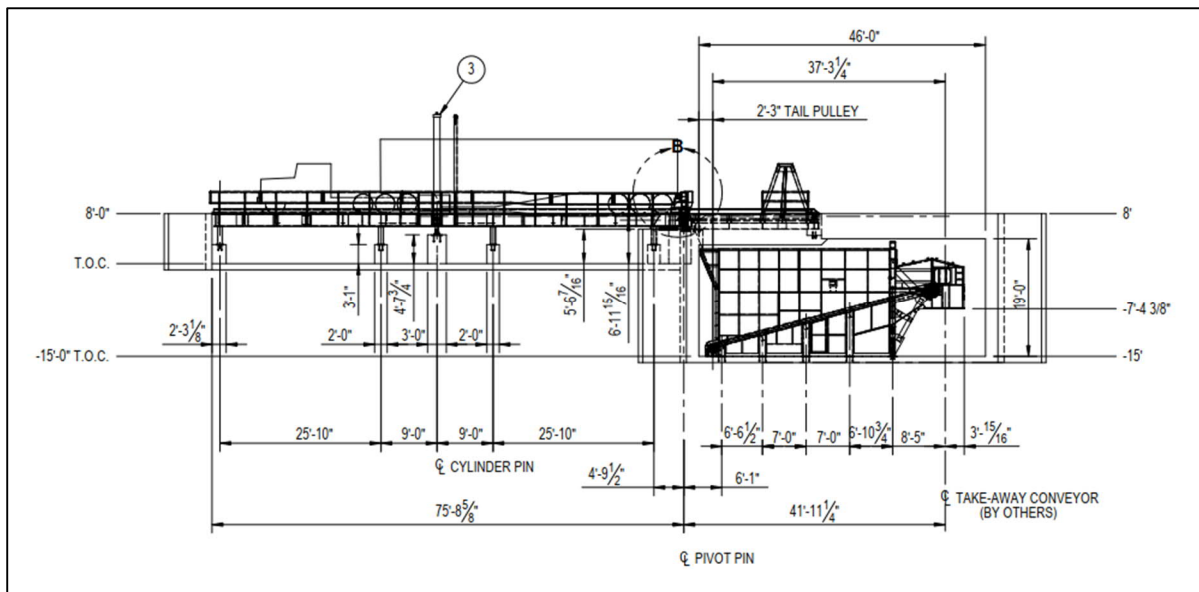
Section View of a Drive Over Truck Tipper with Dumper Hopper, No Ramps (courtesy of Bruks)
